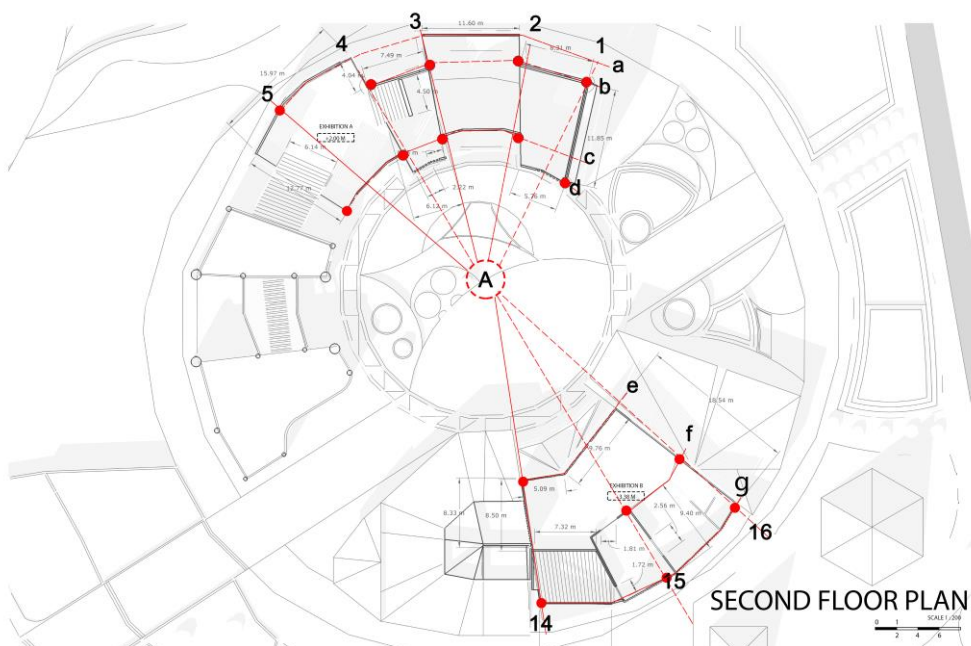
Second Floor Structure Plan (Source: author analysis)
